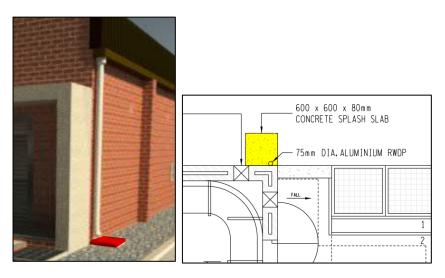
Perspective (left) and plan view (right) of concrete splash slab below rainwater downpipes.
